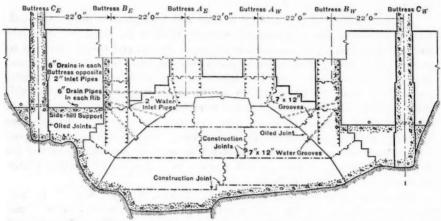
TYPICAL SECTION OF FINAL DESIGN, SHOWING TRANSITION, RODRIGUEZ DAM.
